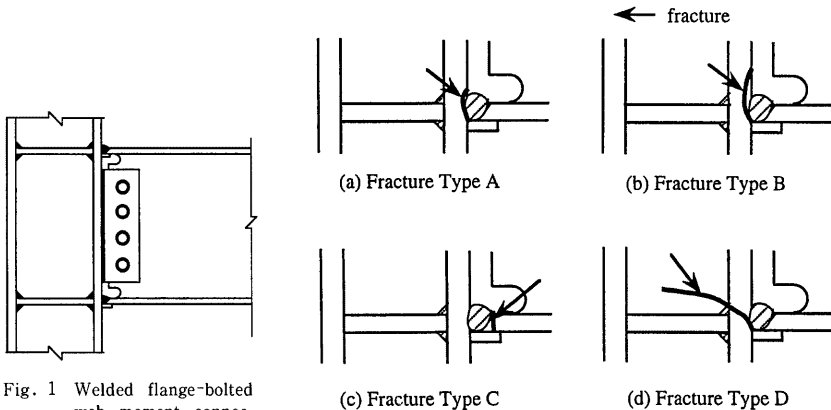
Welded flange-bolted web moment connection popular in West Coast of U.S.
